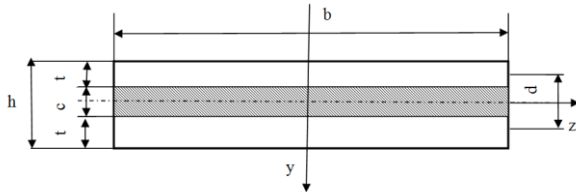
Structural sandwich consisting of two face sheets and a continuous core [9]
